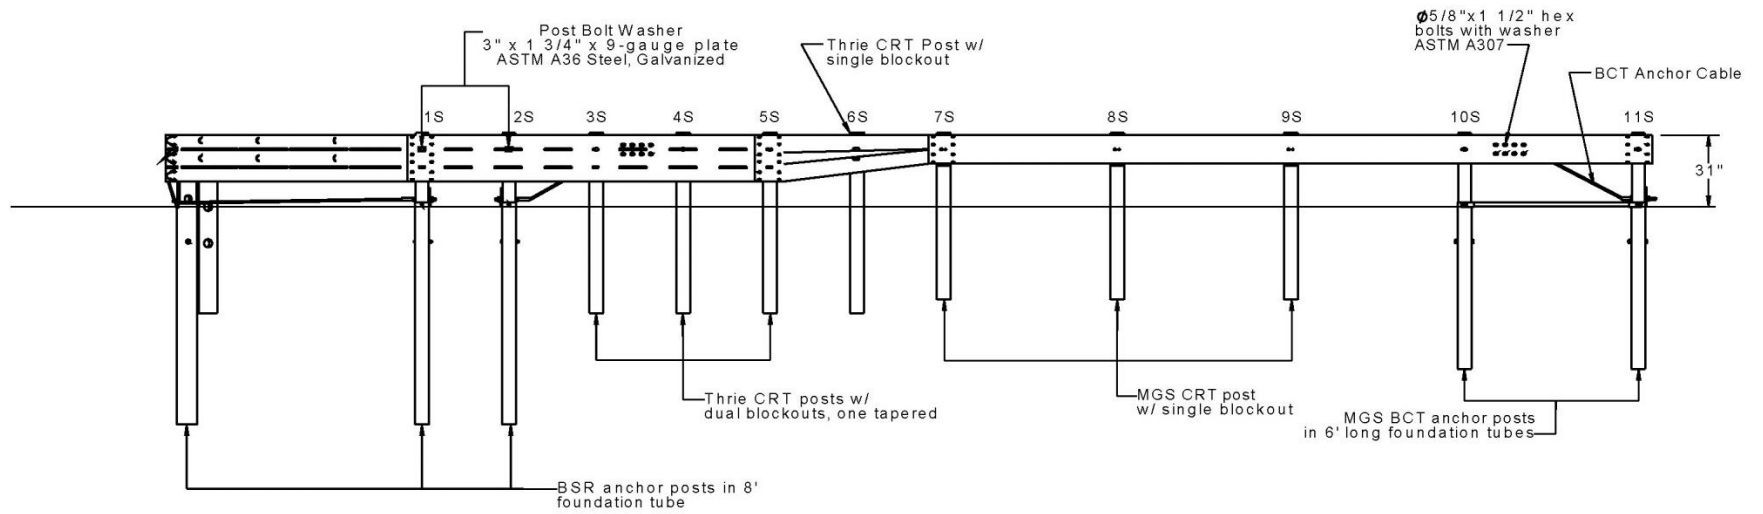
Secondary Side Post Layout, MwRSF Short Radius Design [14]
